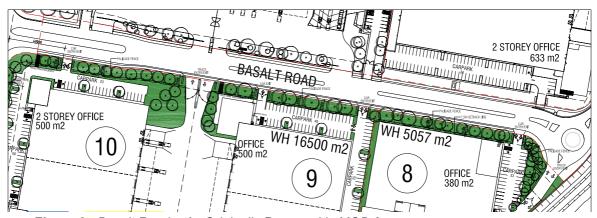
Basalt Road - As Originally Proposed in MOD 2 (Source: Plan MP.08.2 Rev. G)
